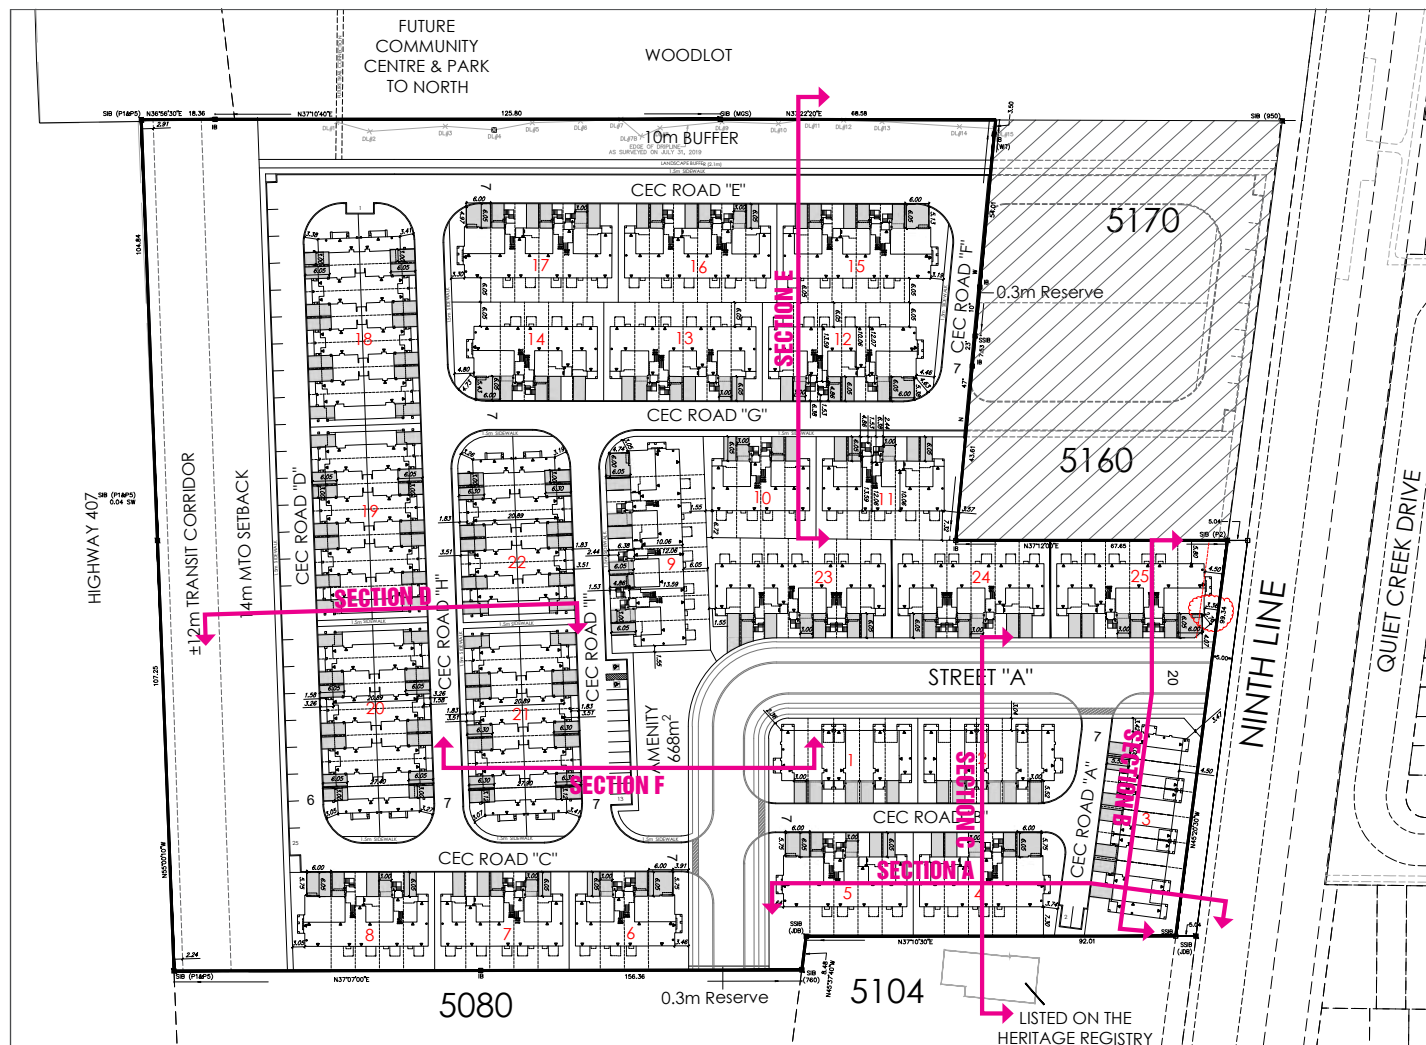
Key plan indicating the location of sections (refer to figures 2.1l - 2.1q)
